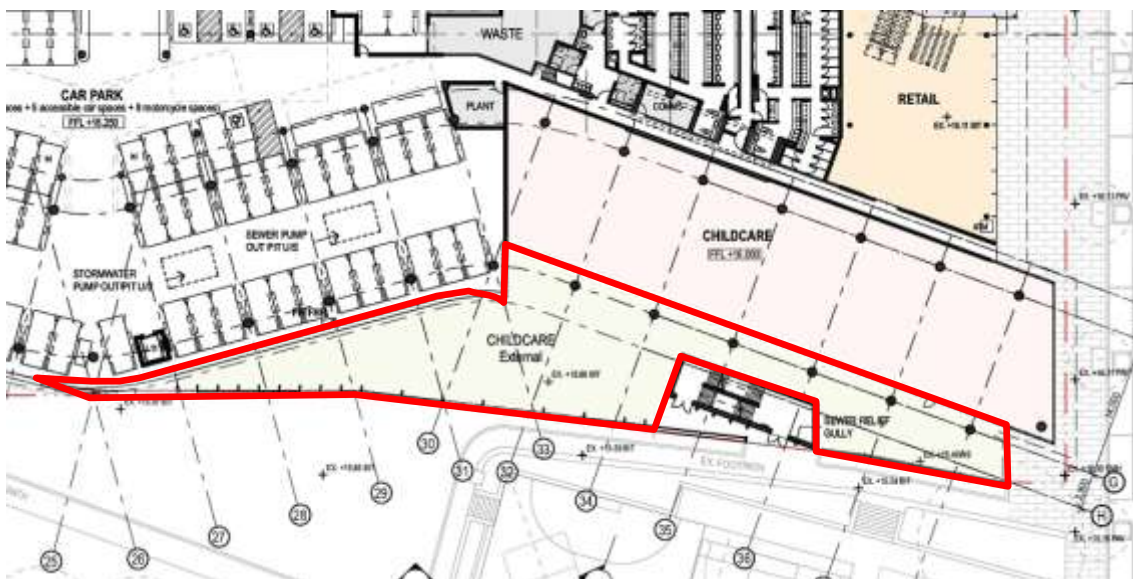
Extract of Building 1 floor plan showing design of child care centre outdoor space
